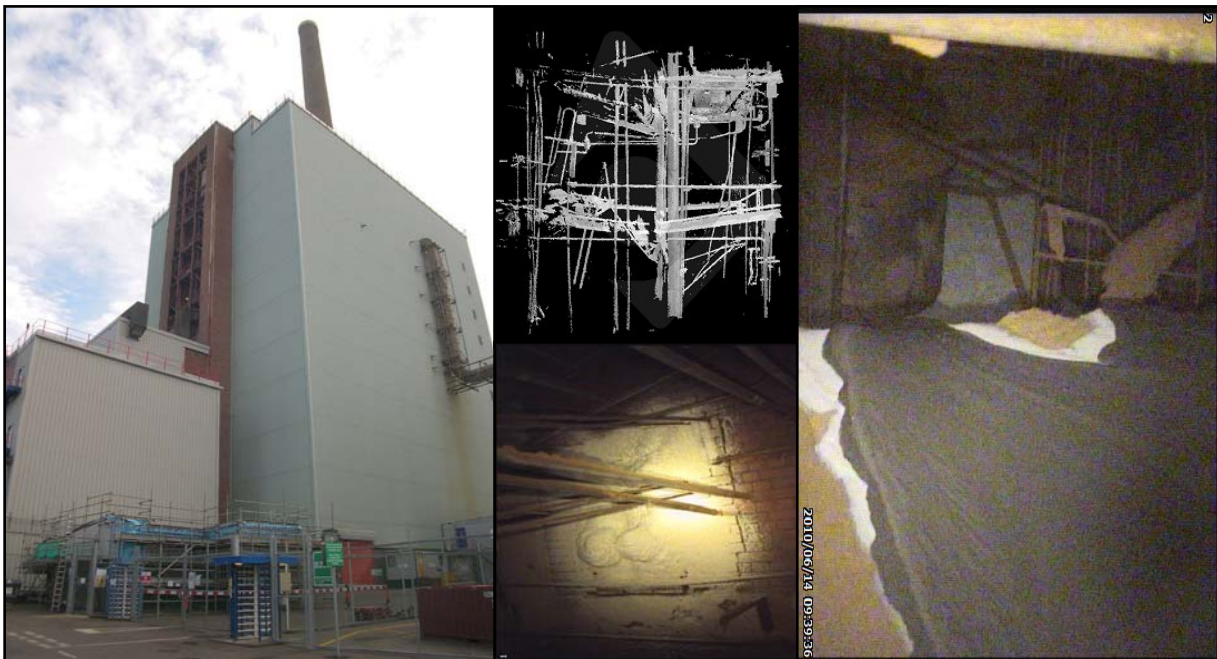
Primary Separation Plant, showing in cell scan of degraded steelwork, wall stabilisation work and grout pour.
